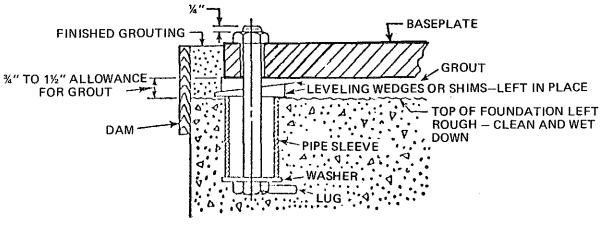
TYPICAL FOUNDATION BOLT DESIGN
